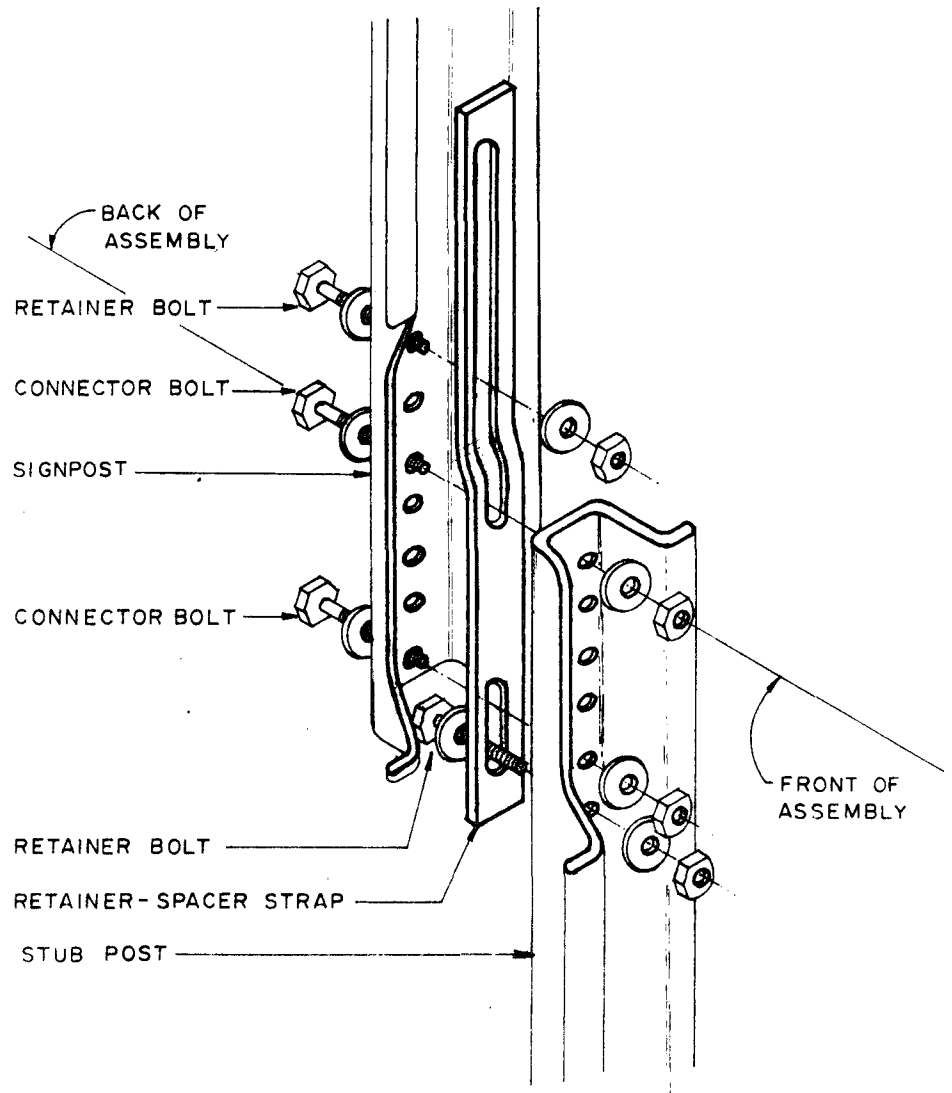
EZE-ERECT SIGNPOST ASSEMBLY
